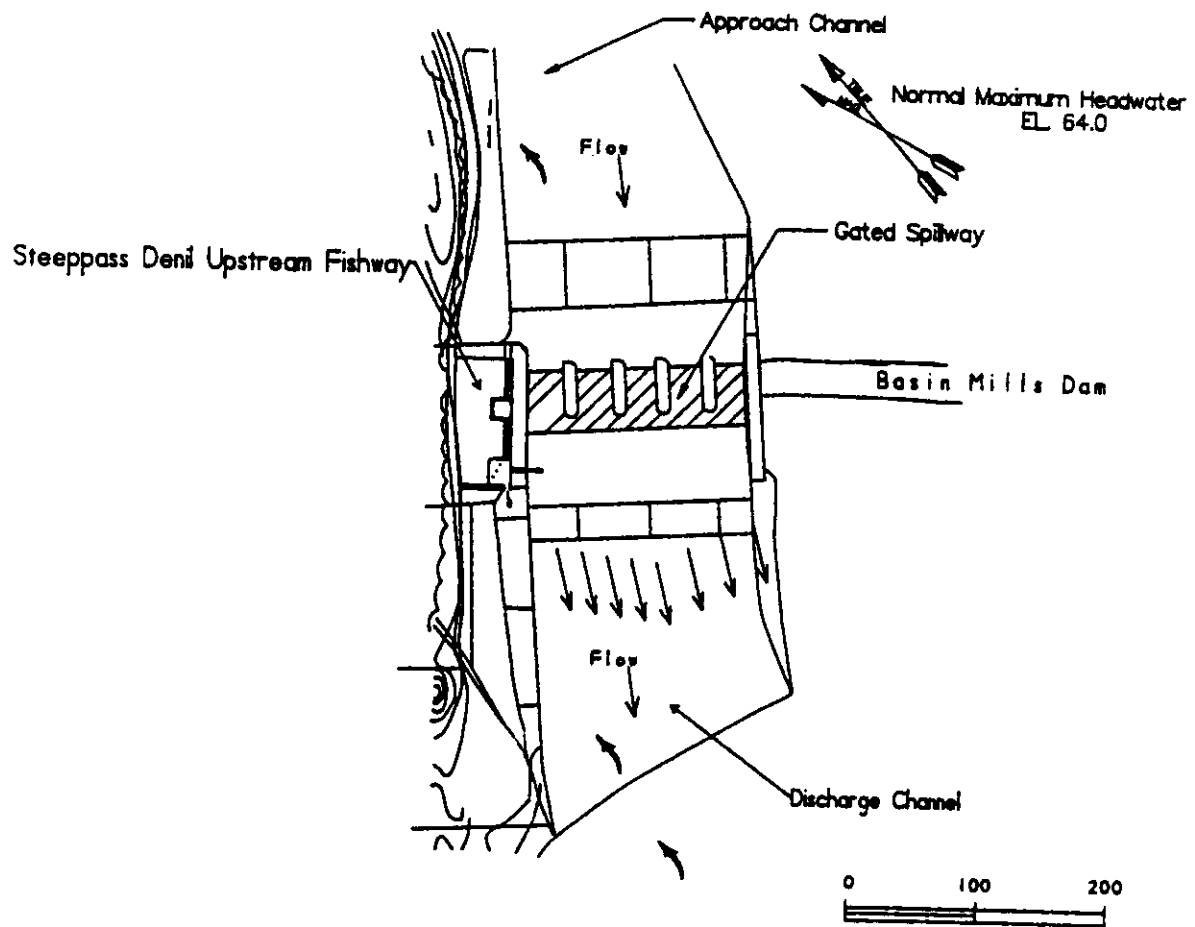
Plan view of the upstream fish passage facilities at the proposed Basin Mills gated spillway (Source: BHE 1990a).
